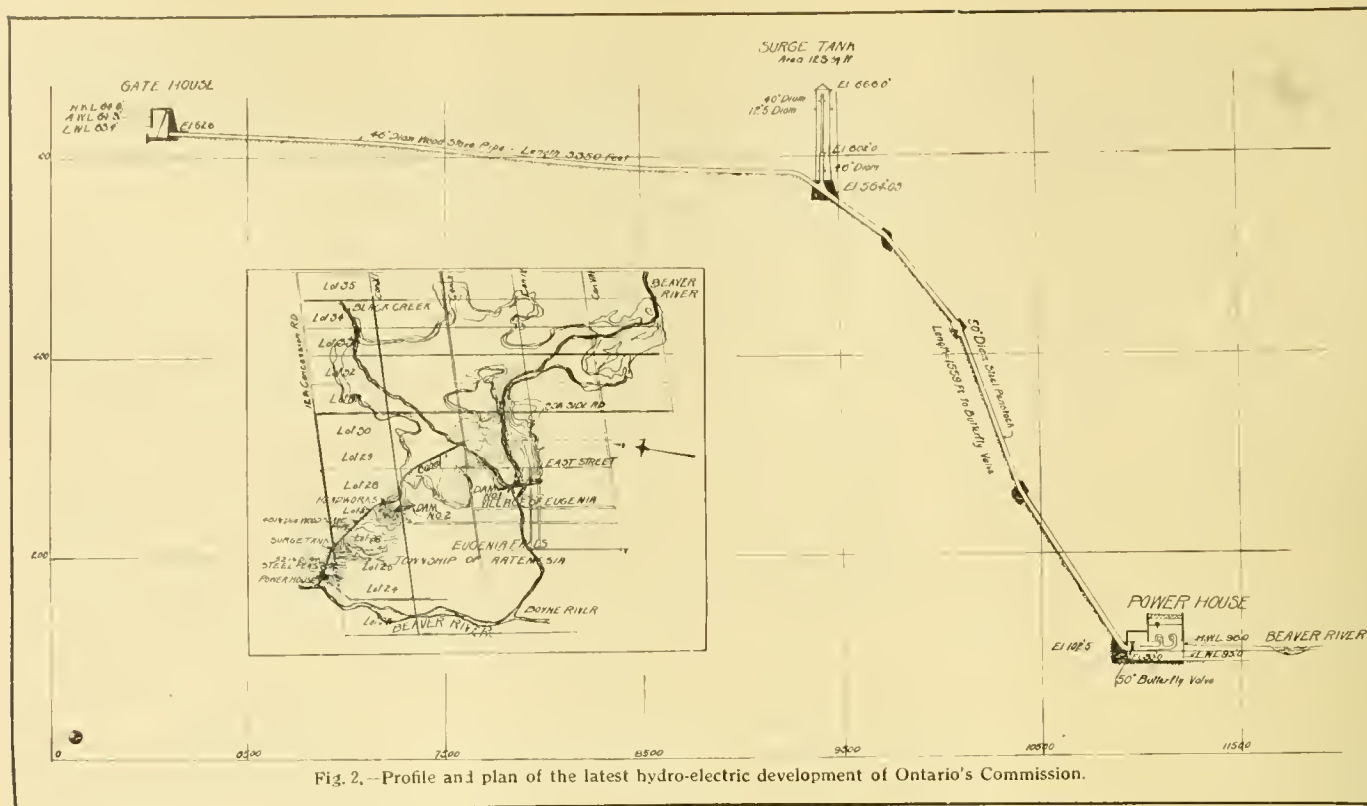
Profile and plan of the latest hydro-electric development of Ontario's Commission.
